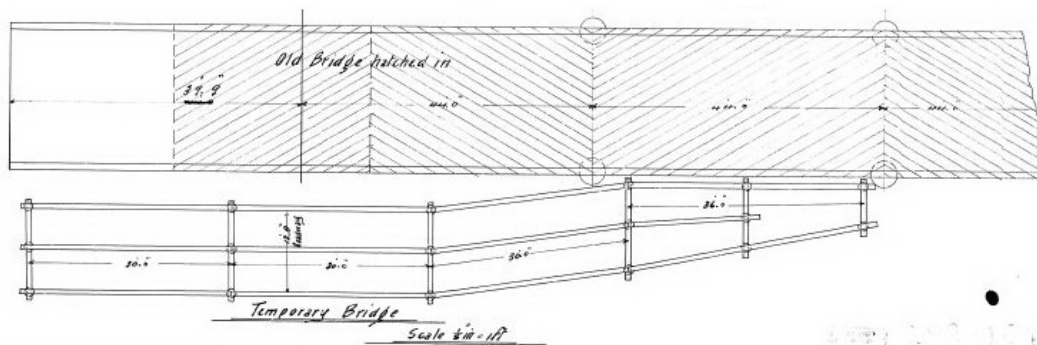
Detail from an 1895 plan showing the proposed location of the temporary bridge on the upstream side of the existing bridge. The extension, which is known to be on the Wilberforce side of the bridge is shown in this plan as the white section.²⁴⁸
